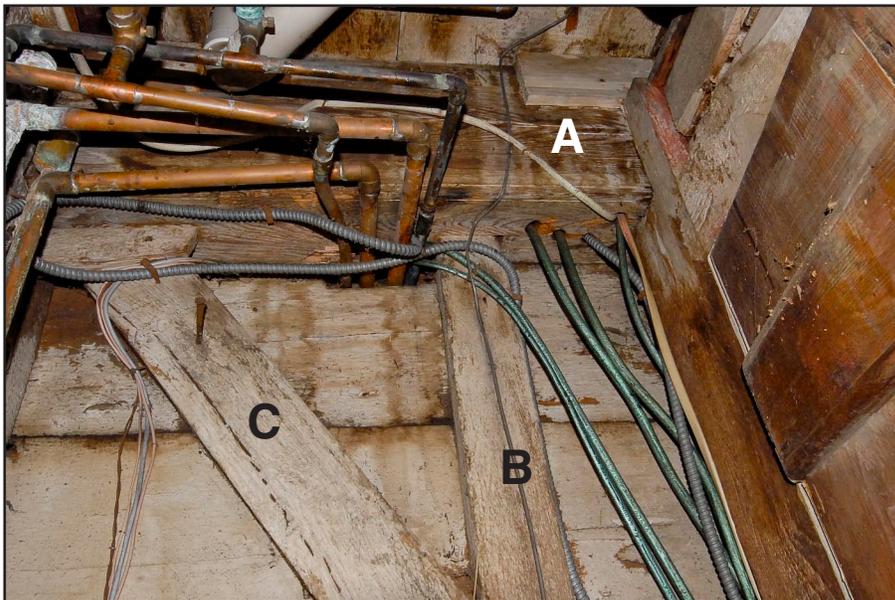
Original west wall parlor framing that remains visible in the cellar stairwell, unfortunately obscured by plumbing for the bathroom above (Room 201B). "A" marks the west parlor wall girt, "B" marks a wall stud, and "C" marks a rising diagonal brace, which were installed at each corner of the original frame.
